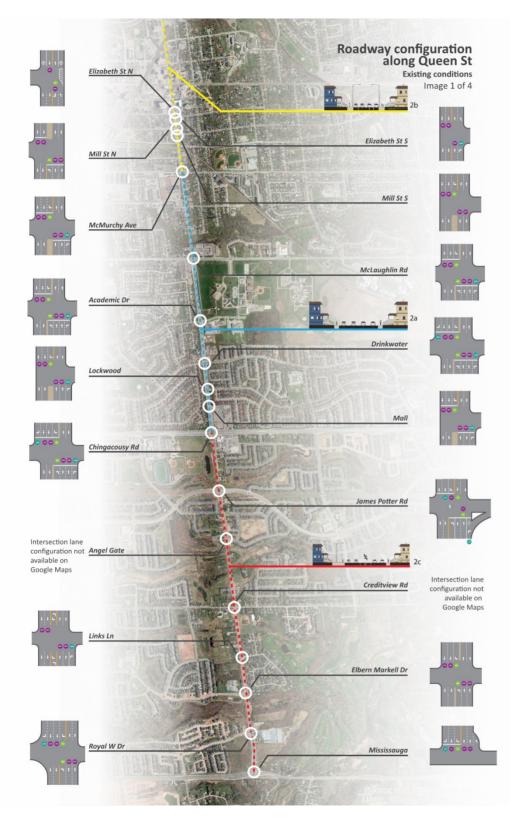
Roadway configuration along Queen Street, Mississauga Road to Mill Street North
